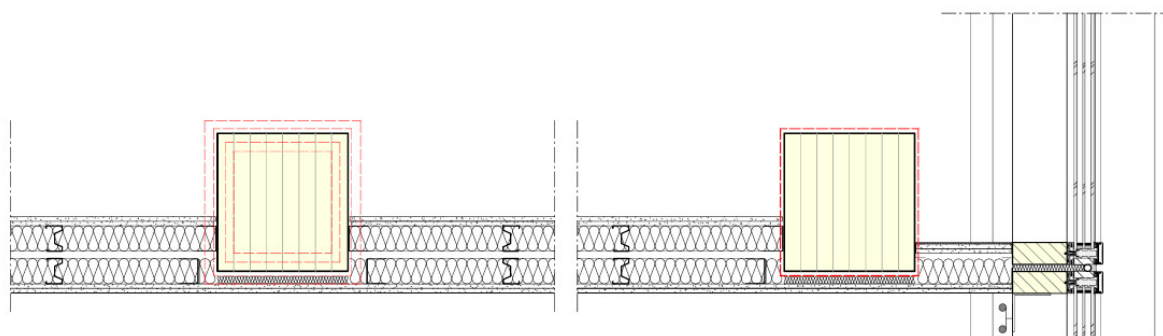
Detail drawing of how walls can connect to the façade without complication.
